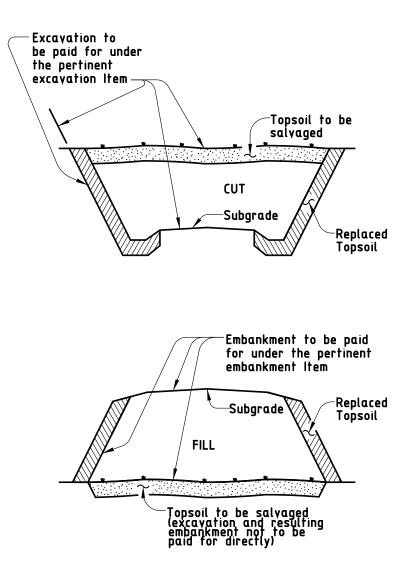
Roadway Cross-Sections Showing Payment for Excavation and Embankment
